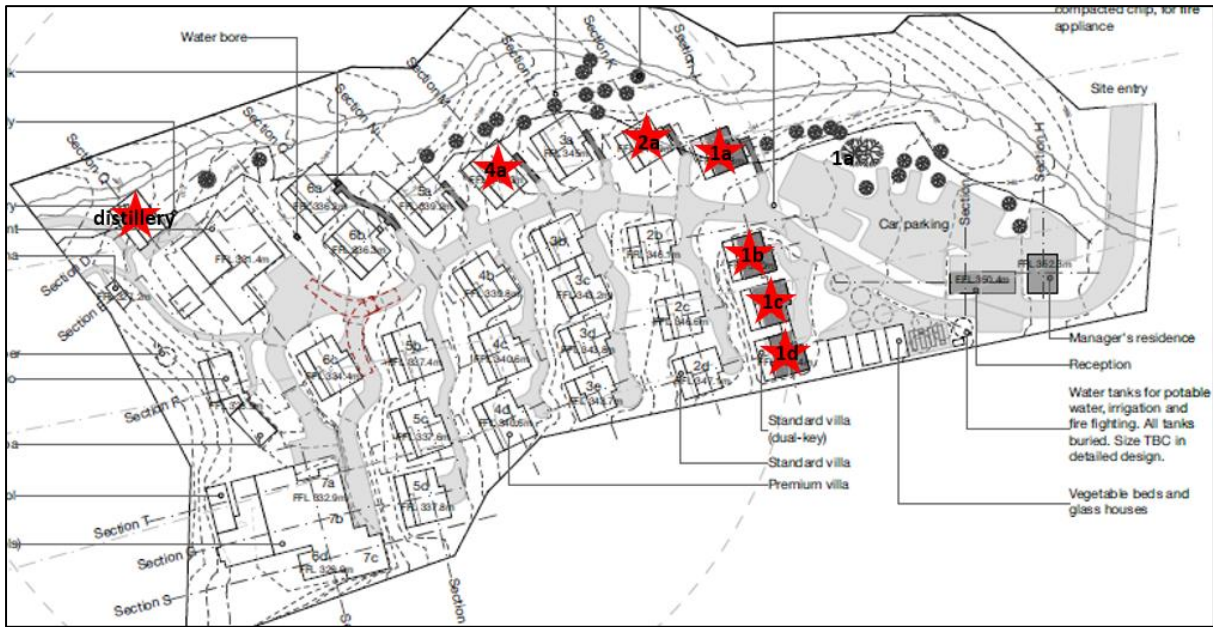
Site Plan showing buildings with height plane breaches marked in red stars and as listed in Table 4
